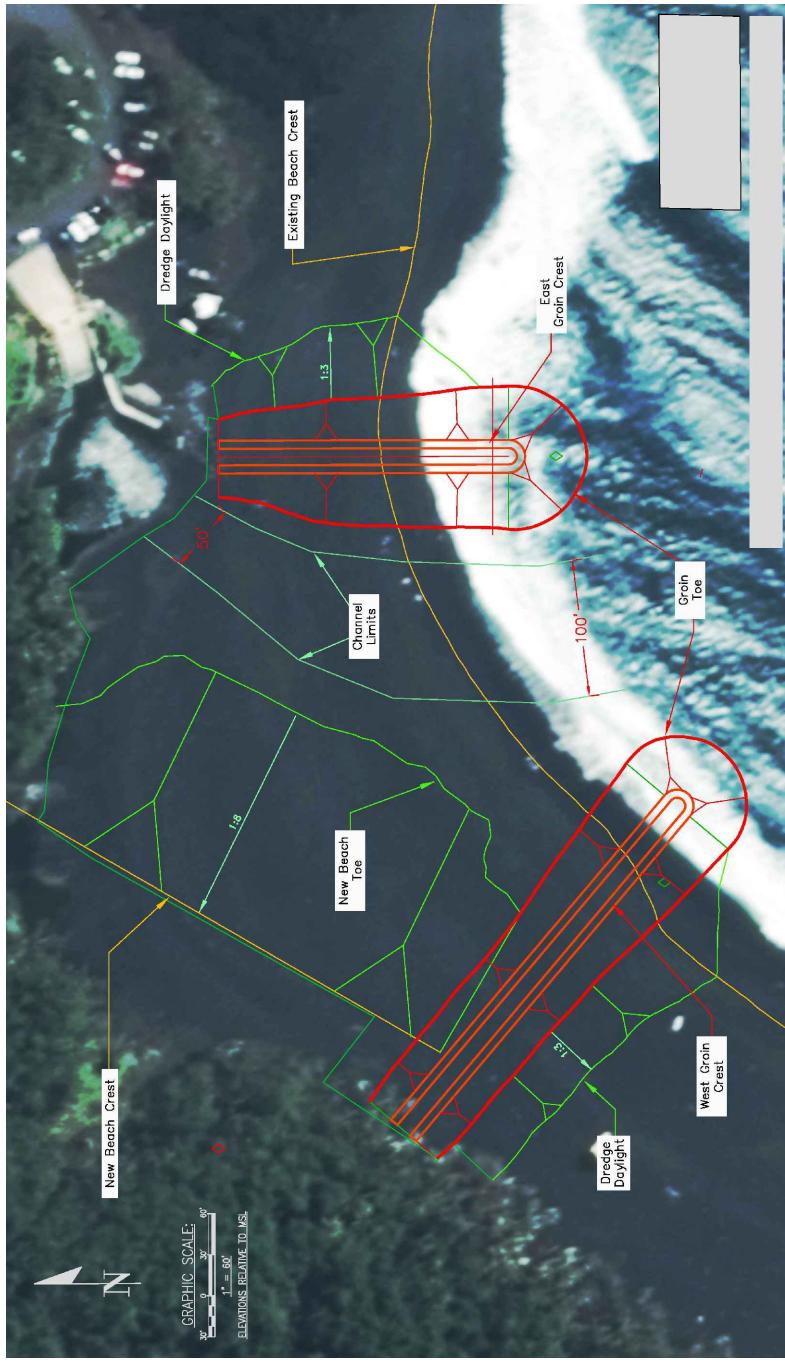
depicts a conceptual plan view and typical jetty section prepared by Sea Engineering, Inc. for Alternative 3, which adds more public infrastructure at Pohoiki Bay. Alternative 3 consists of dredging and disposing of approximately 105,000 cubic yards of backfill to construct east and west jetties in addition to a channel. Excavation between the jetties would provide access to the ramp on the former shoreline. The channel limits would have a depth of 6 feet and a width of 50 feet at the ramp, opening up to 100 feet at the seaward end. Debris would remain along the shoreline landward of the channel, with an 8H:1V beach face. The east and west jetties would be 210 feet and 310 feet in length, respectively, and reinforced with Core-Loc armor and stone before being topped with a concrete crest cap.
